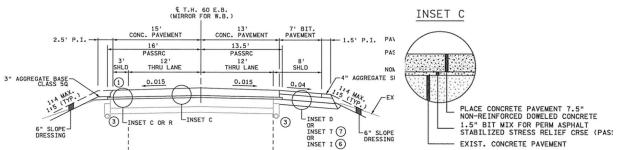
TH-60 design plans for unbonded overlay on a PASSRC interlayer
